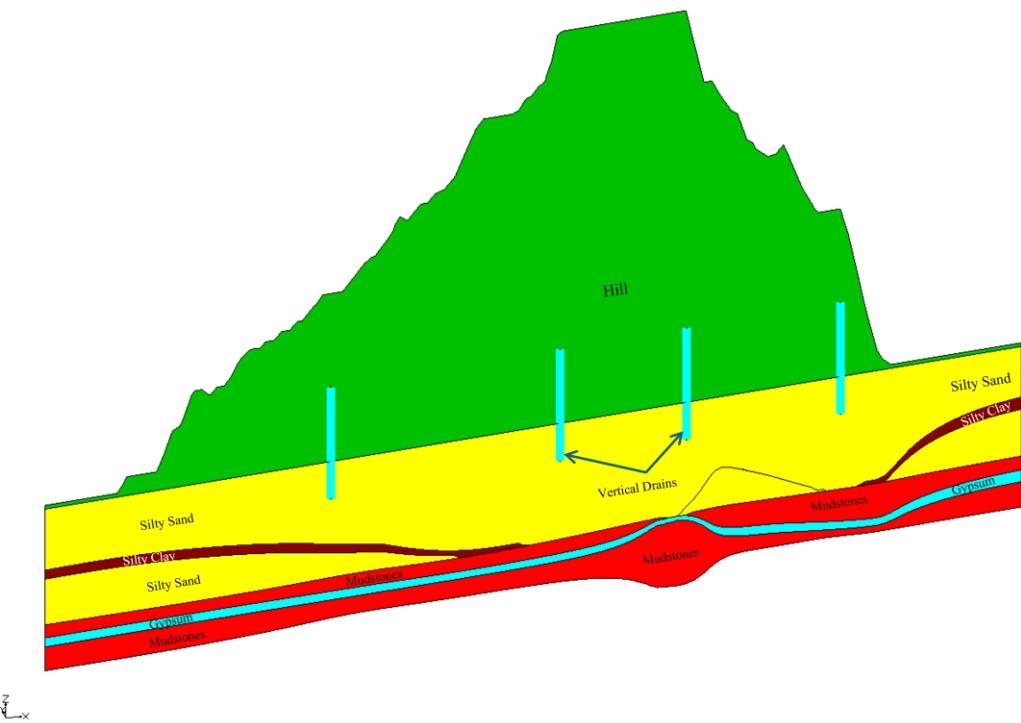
Drainage system (Vertical drains) along cross section A-A.
